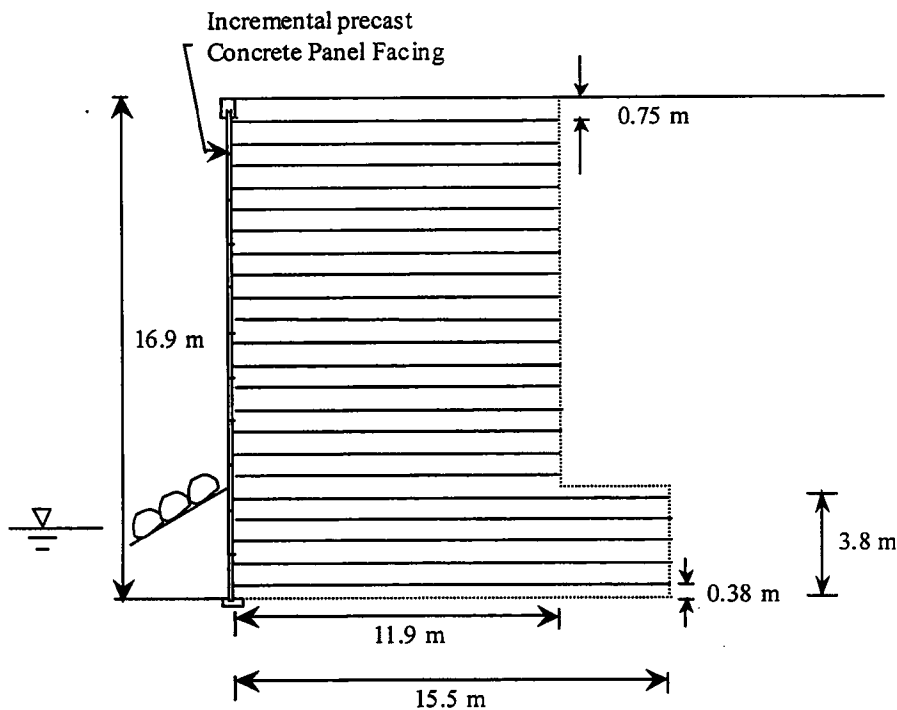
INDOT Minnow Creek steel strip MSE wall (adapted from Runser et al., in press).
